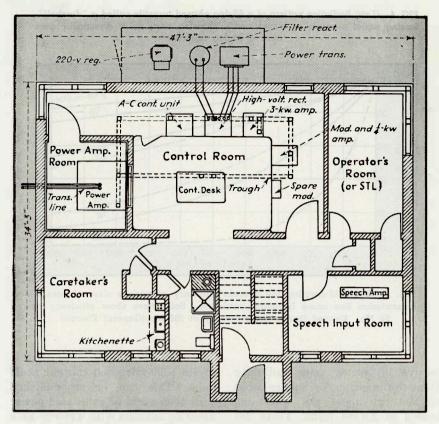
First-floor plan of the WMFM transmitter building at Richfield, Wisc.
